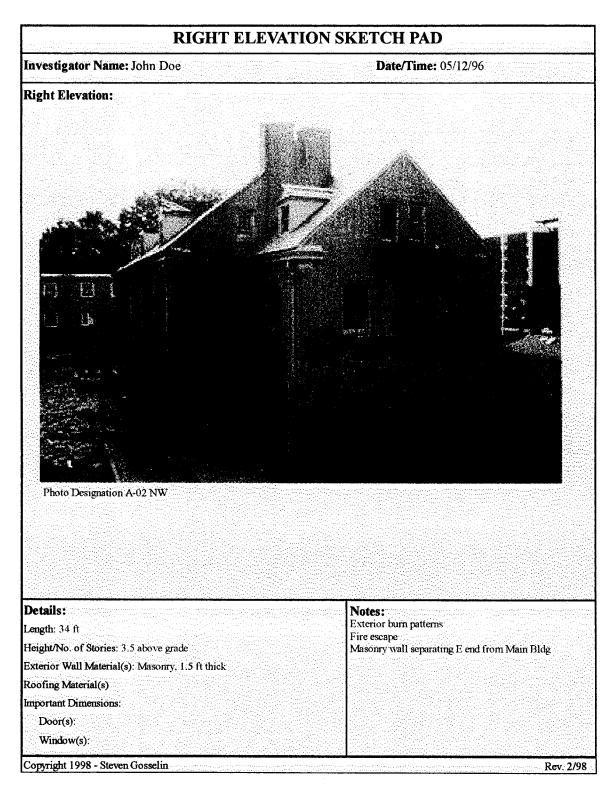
D – Completed example Right Elevation Sketch Pad (Photo ©NFPA Fire Investigations Department. Used with permission. 78)
